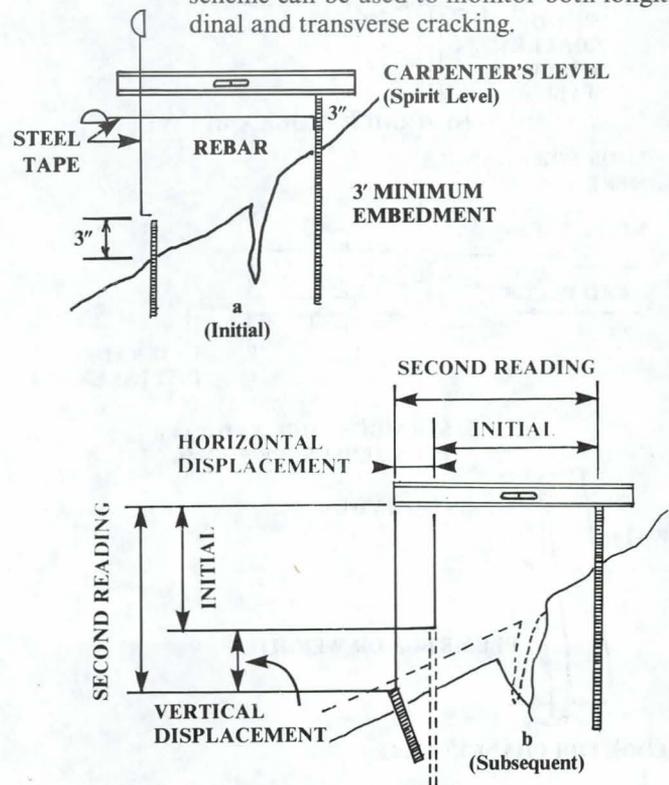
MONITORING CRACKS ON EMBANKMENT
